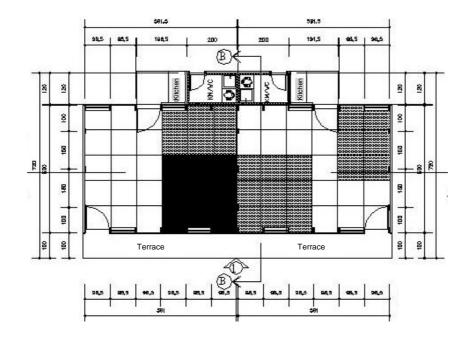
RIA House Plan(Silas and Setyawan, 2010)
